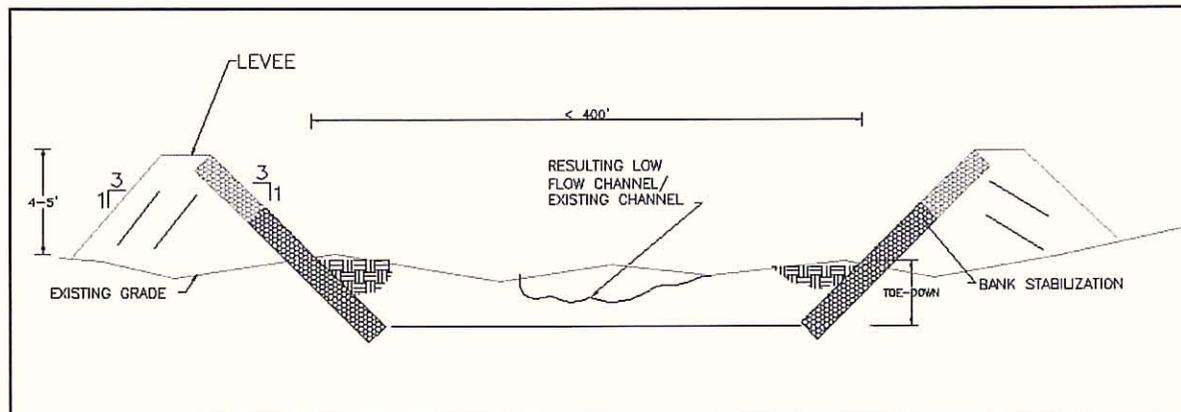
Concept Cross Section for Earthen Leveed Corridor (Alternatives A, B1, B2, B4, B5) (Not to scale)
